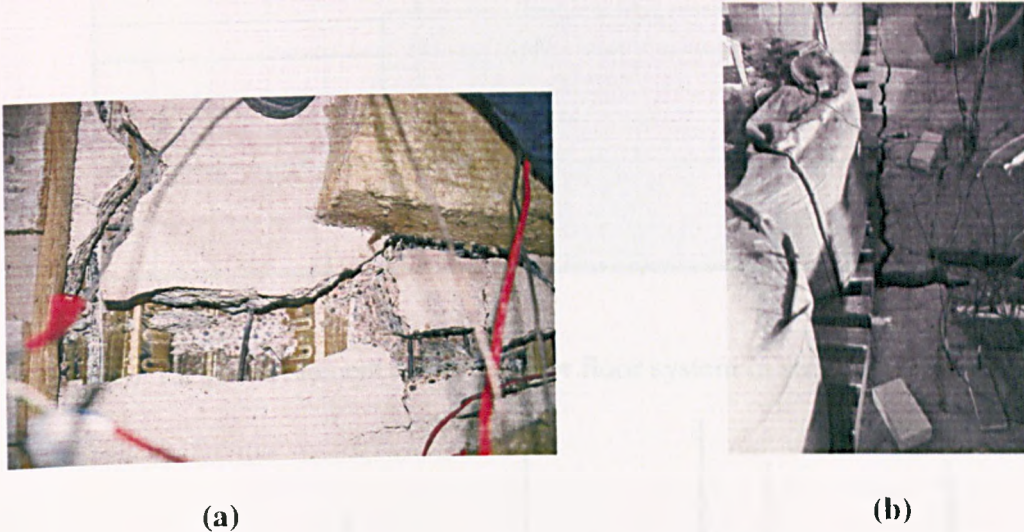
a) Slipping of the reinforcement and b) Central transverse crack at mid-span after fire test
